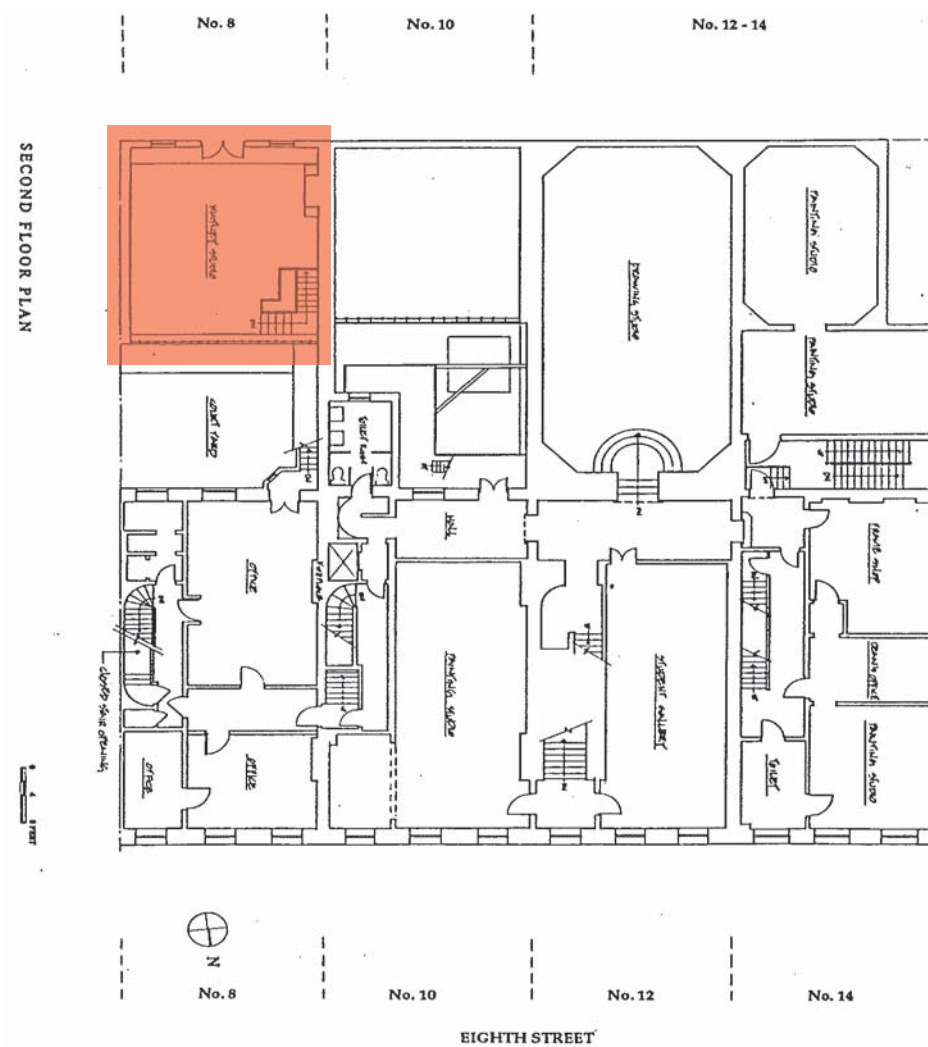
Second floor plan of the New York Studio School with Whitney Studio highlighted (HSR, 1993).
